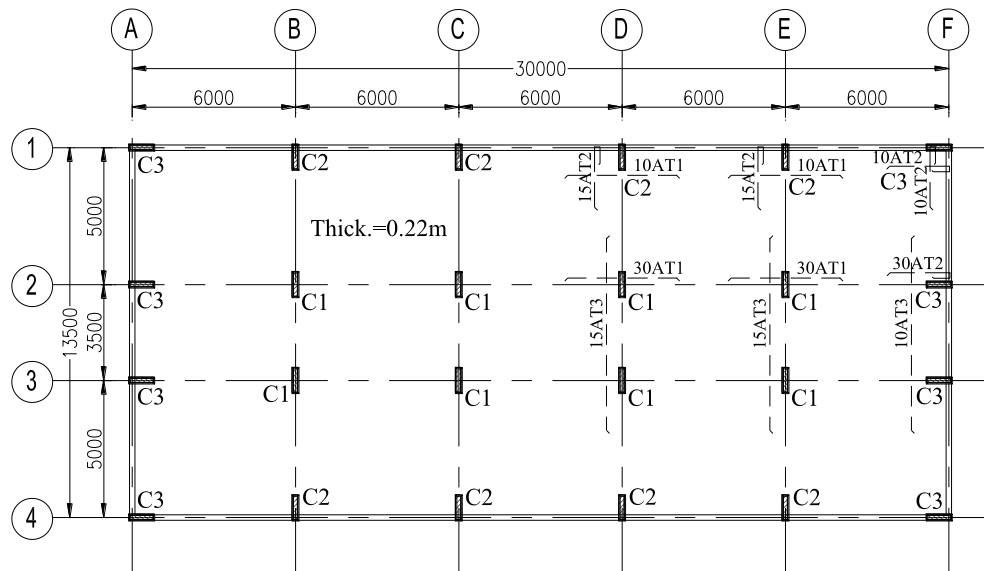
Typical reinforcement details for the floor slabs of the 8-story building
